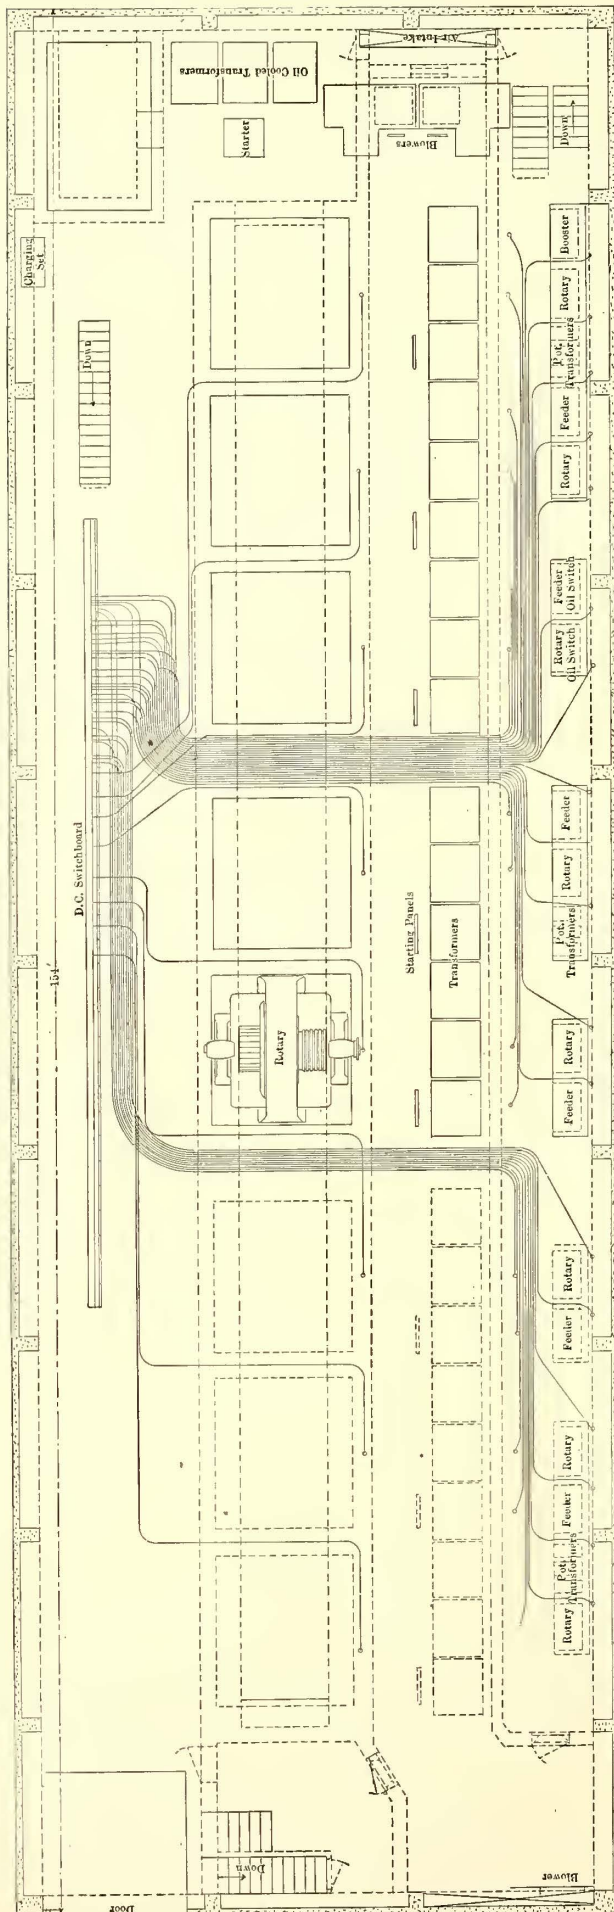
PLAN OF CENTRAL SUBSTATION, SHOWING CONTROL WIRING
